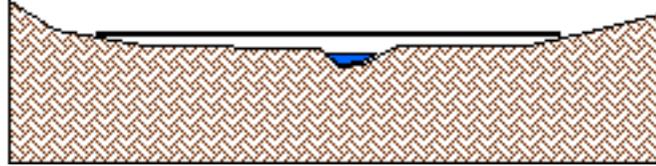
Center setback areas over the floodway with matching elevations at either boundary.
